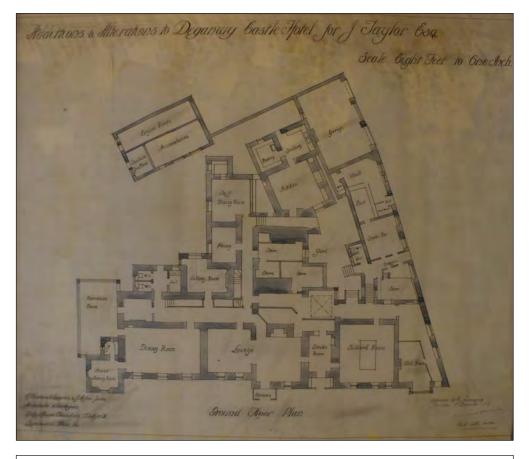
1919 Architects Plan of Deganwy Castle Hotel Prior to the Remodelling of That Year (Source: Conwy Archives C Maps & Plans 22/3)
